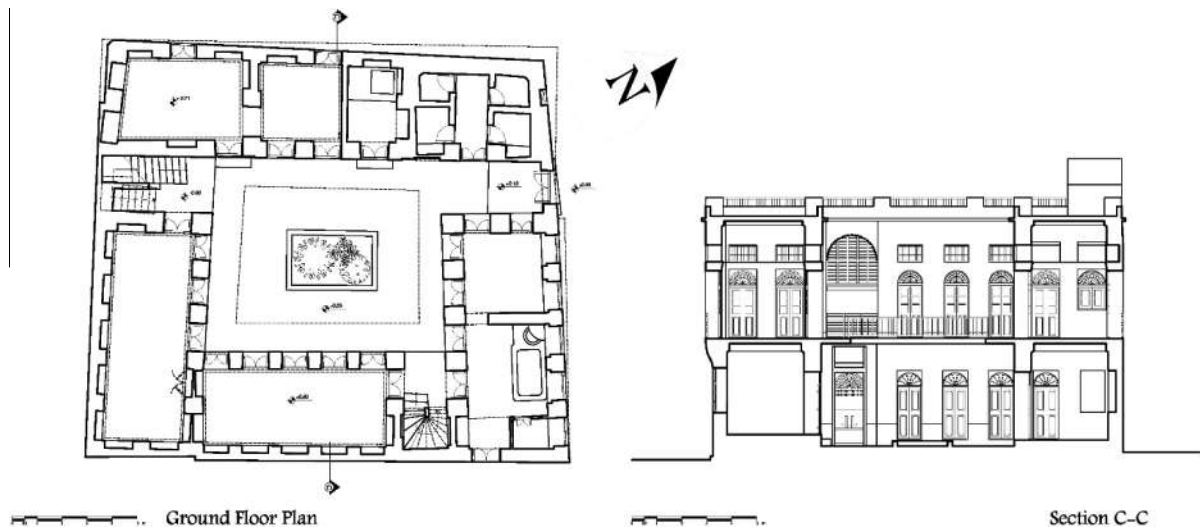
Ground floor plan and Section C-C, Rashidi house, Bushehr (source: Khajehzadeh and Yavari (2012)).
